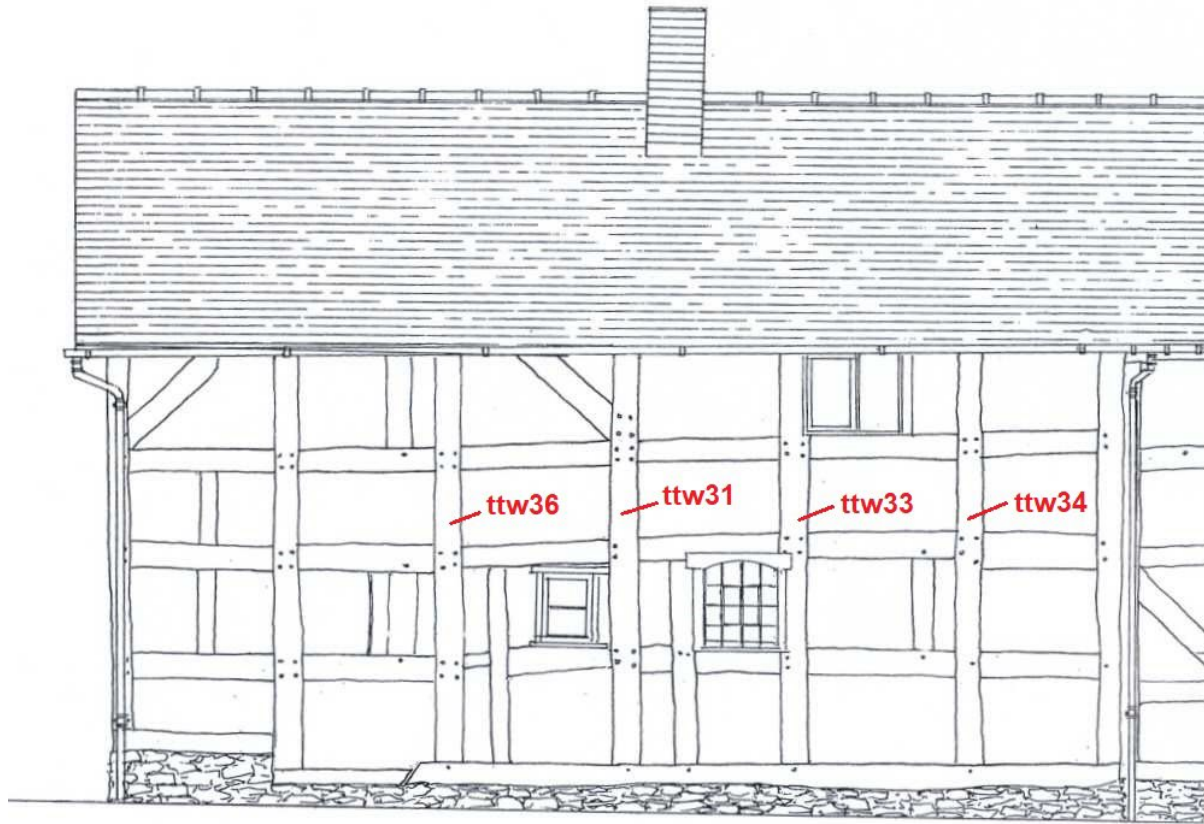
North elevation of bays 3 and 4 showing timbers sampled for dendrochronology (adapted from an original drawing by Andrew Thomas)
